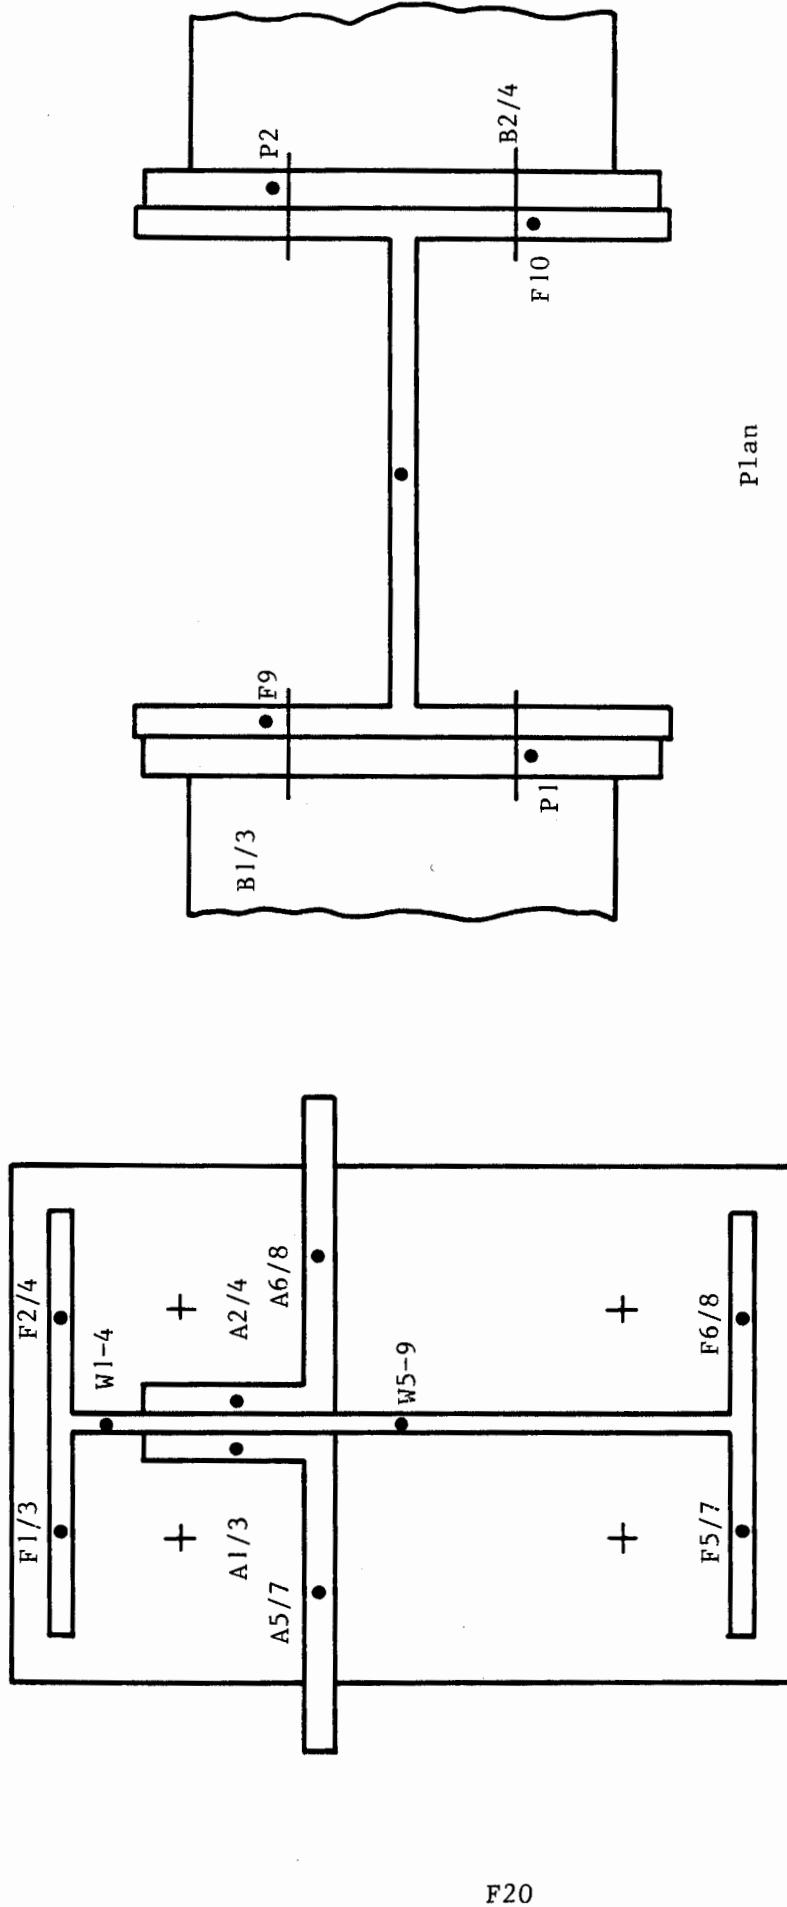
THERMOCOUPLE POSITIONS - ASSEMBLY NO. 8
